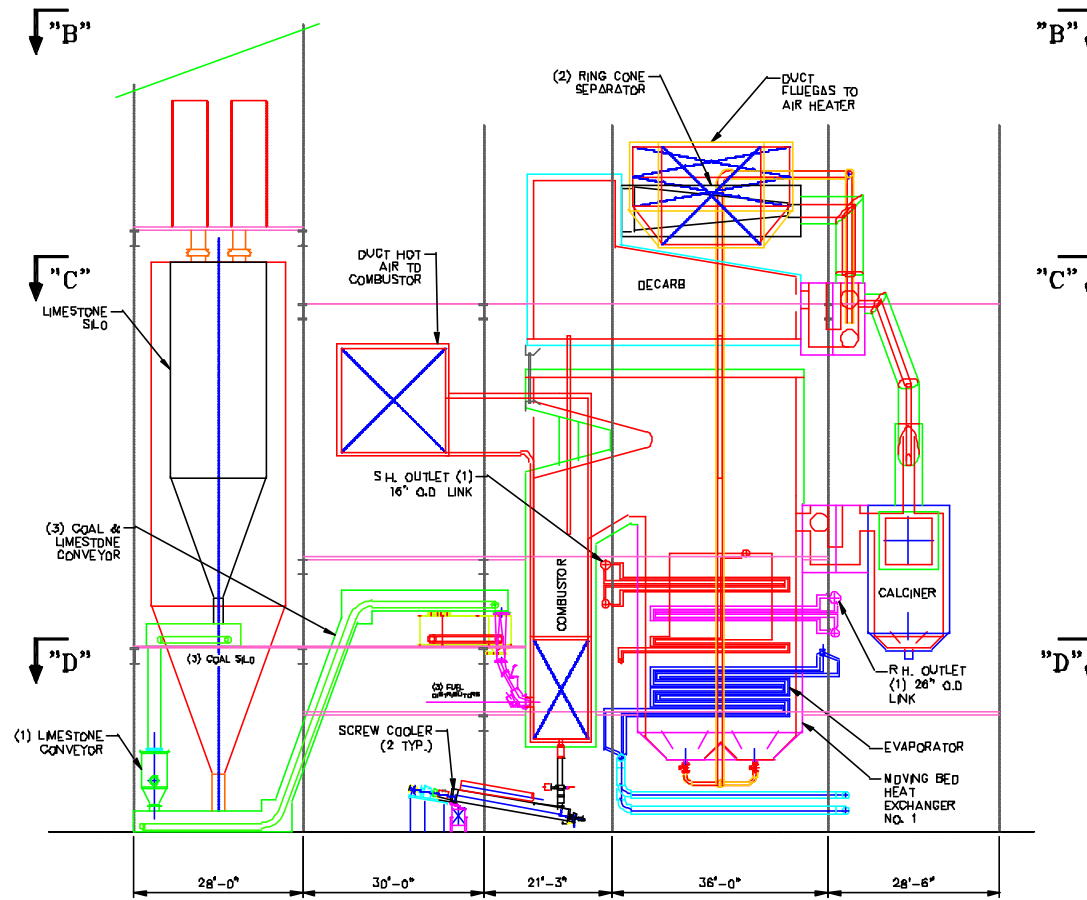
2: Case-5 Boiler Island General Arrangement Drawing – Side Elevation
